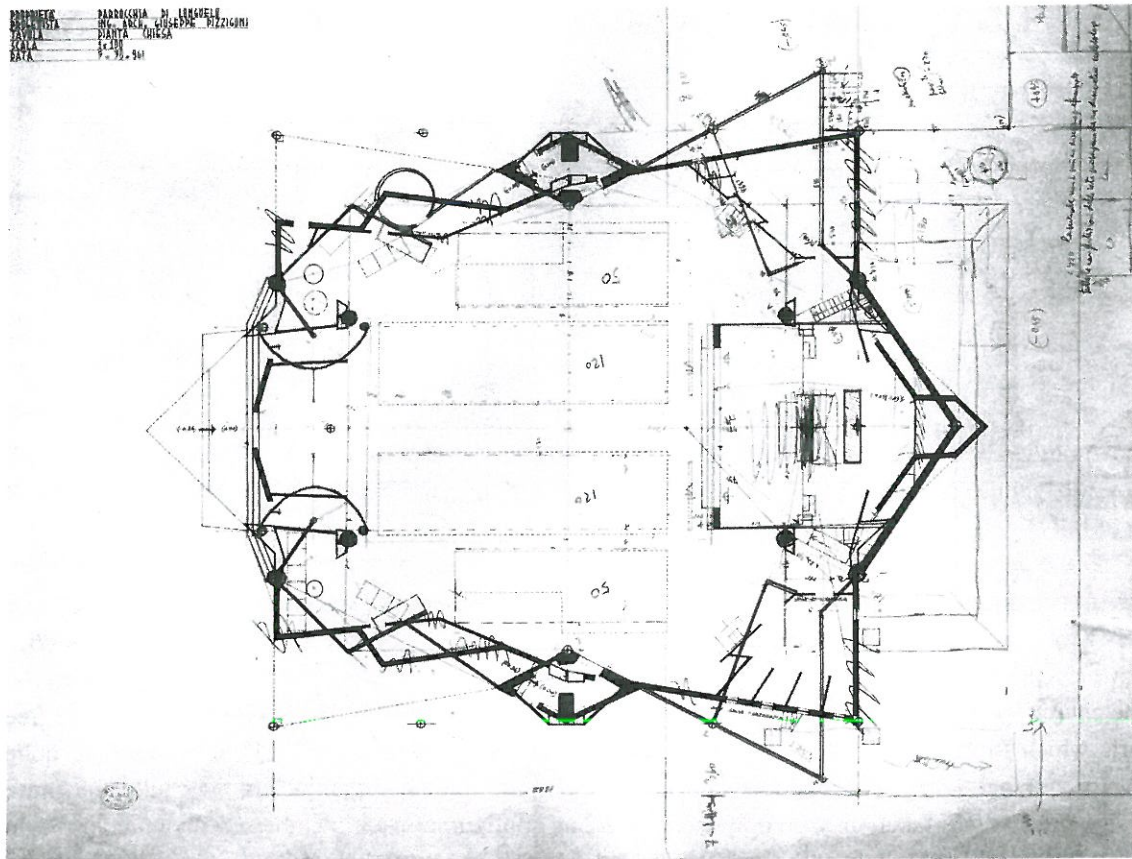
Longuelo Church: plan, showing modifications made in the last months.
